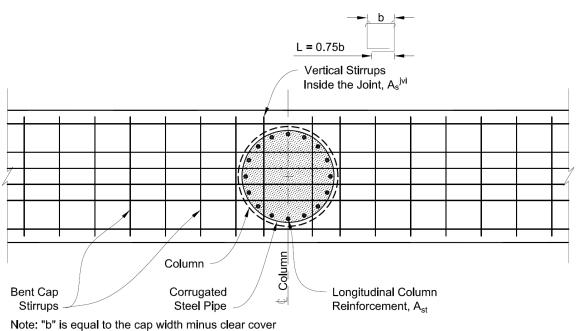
Cap Pocket Joint Shear Reinforcement Details (Plan)—SDC A
